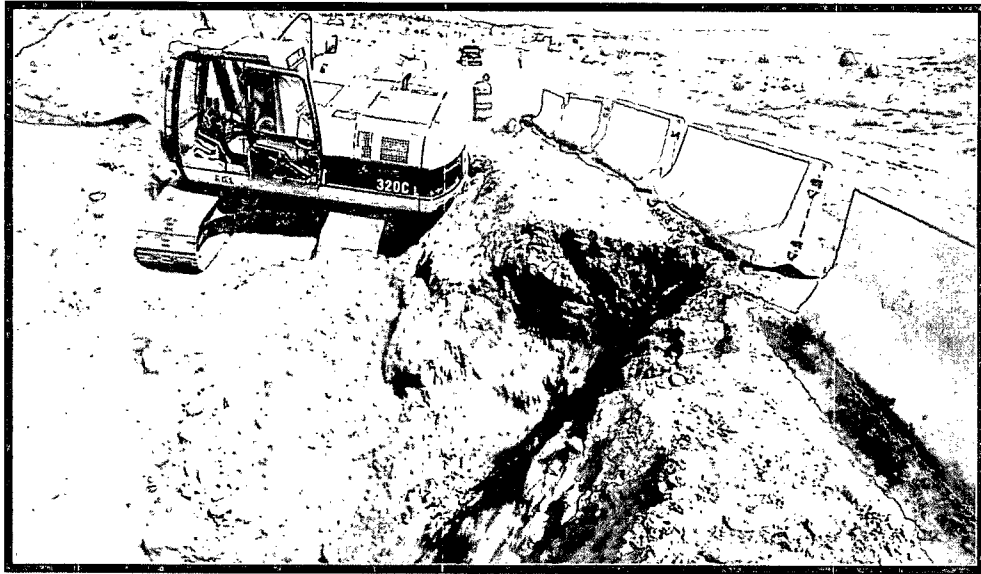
Contamination extended into the road base but was able to be removed by creating a shoofly to divert traffic to the east. Concrete barriers and barrels where used for safety.
